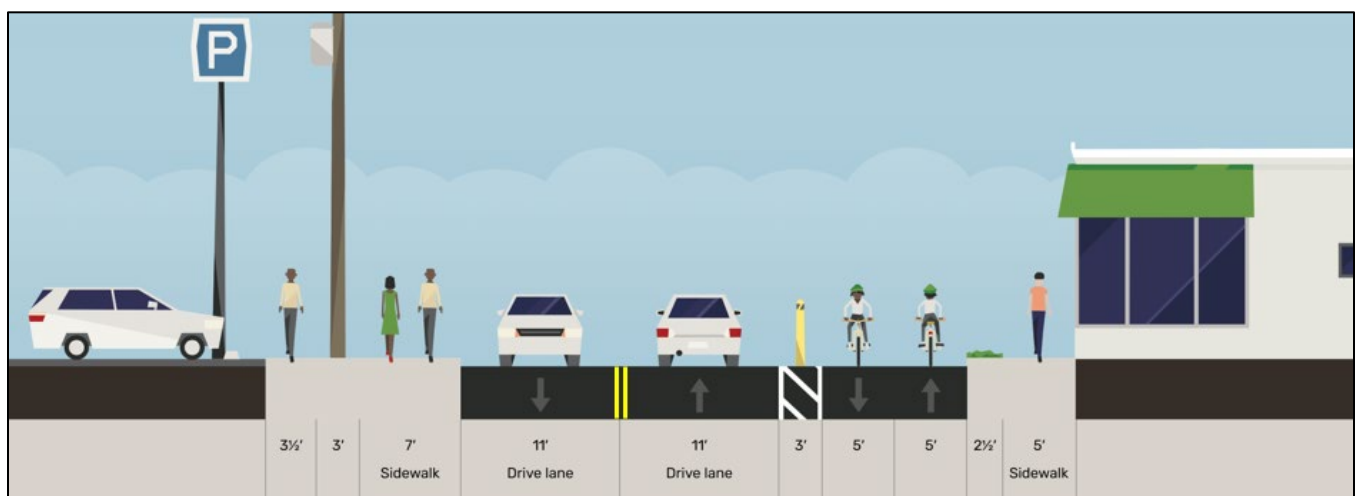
County Road Alternative Cross Section 2 (Narrows Existing Curb to Curb Width)
